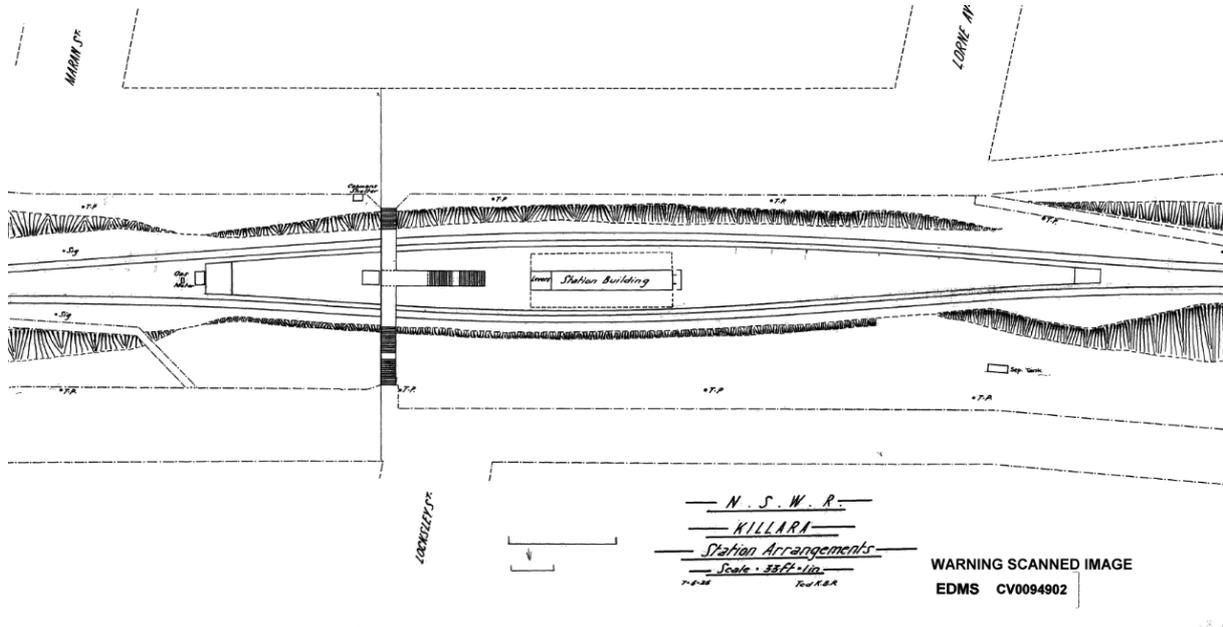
Killara Station layout, 1925 (Sydney Trains Virtual Plan Room)
